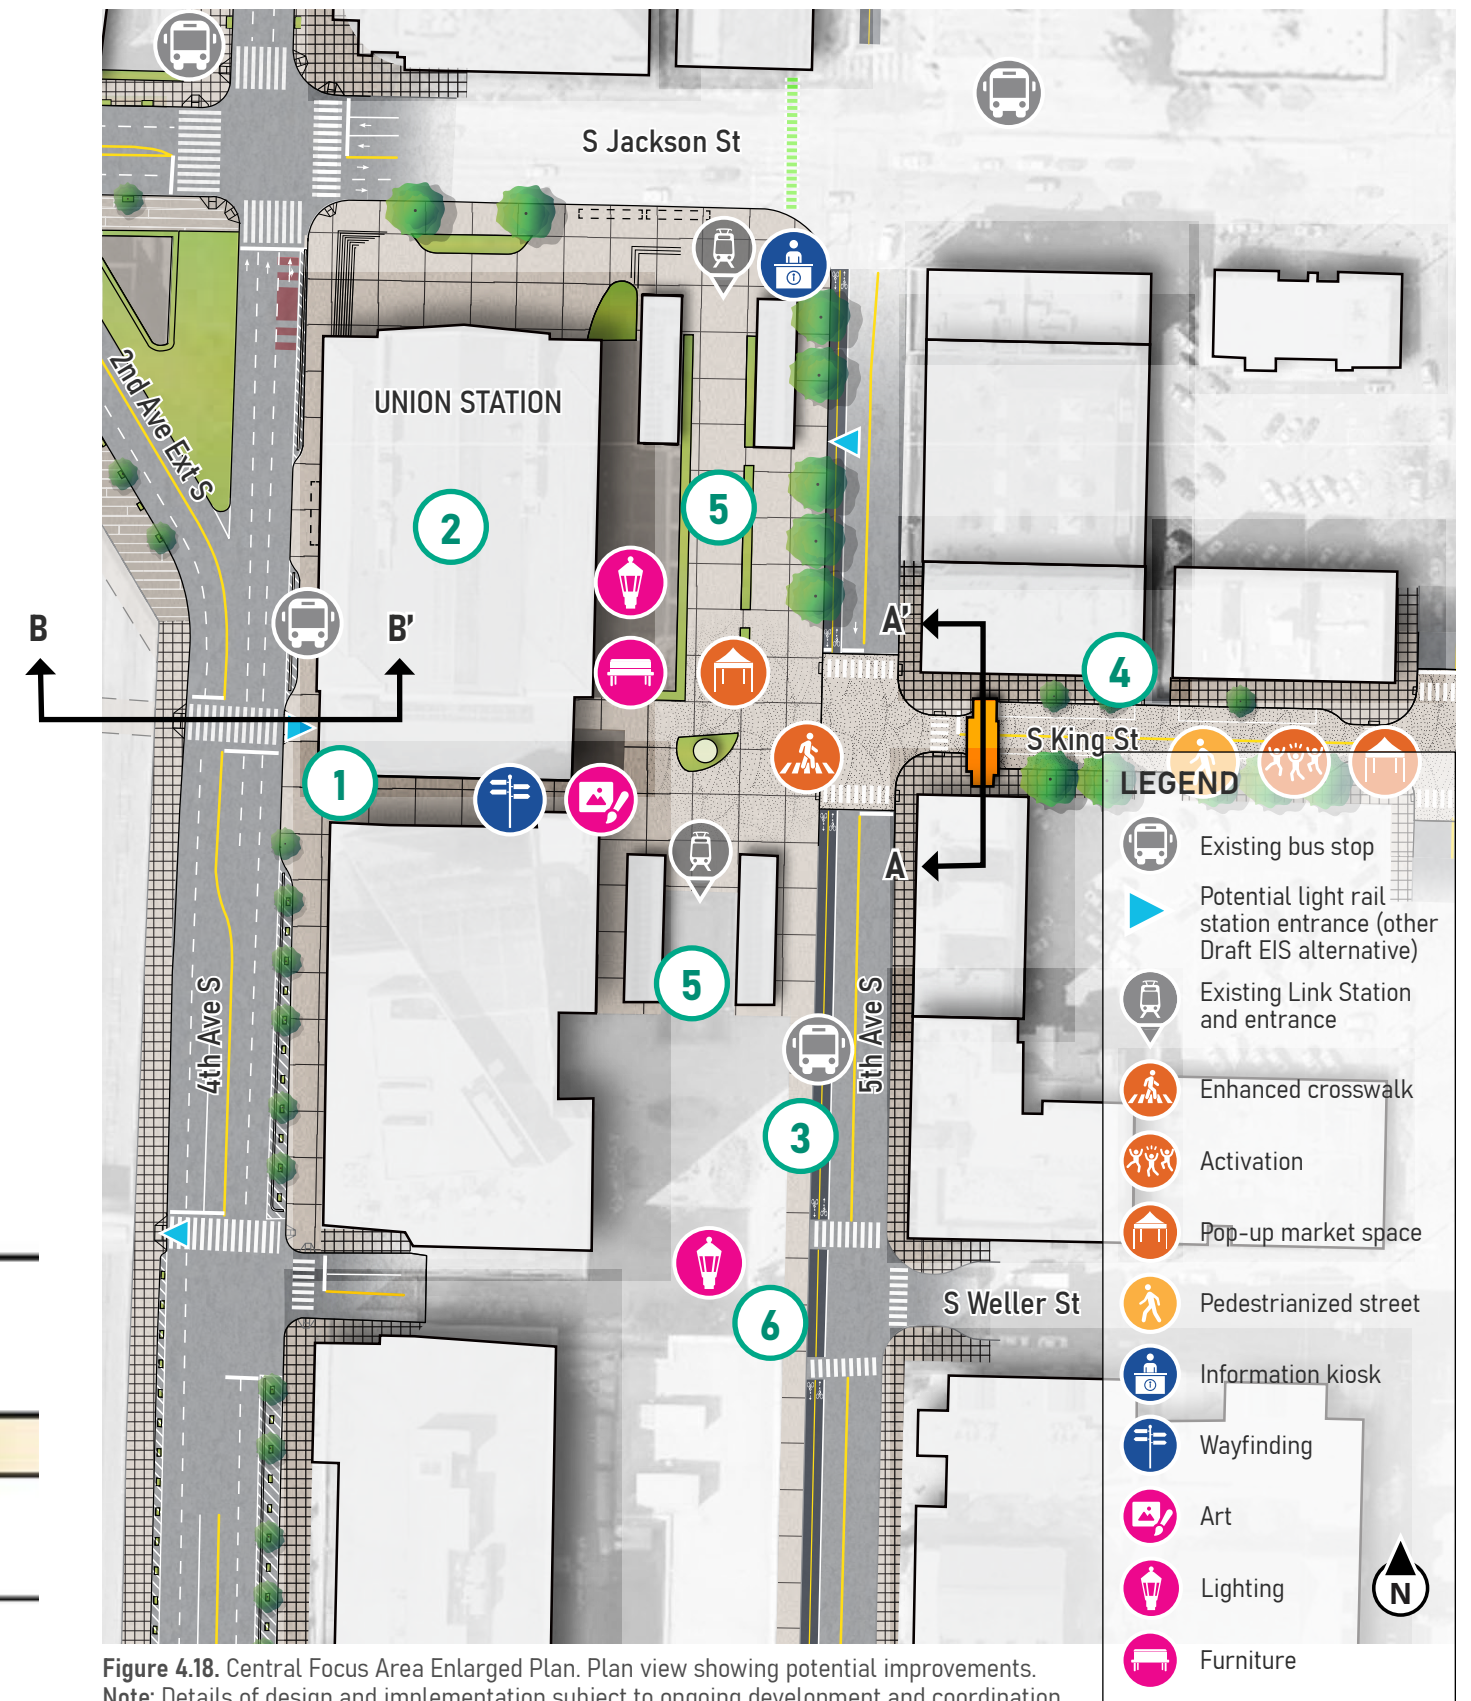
Central Focus Area Enlarged Plan. Plan view showing potential improvements. Note: Details of design and implementation subject to ongoing development and coordination.
